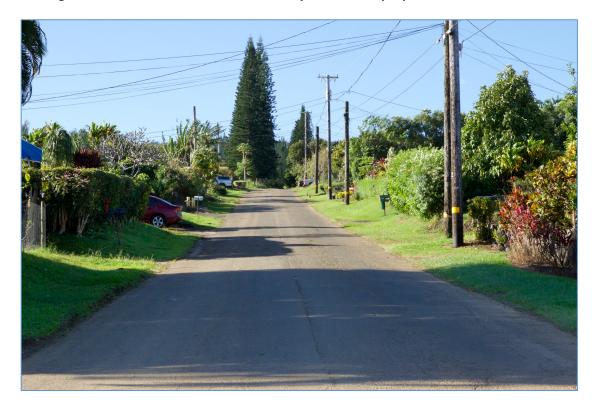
Upper Ma'ulili Road looking mauka toward the tank site
